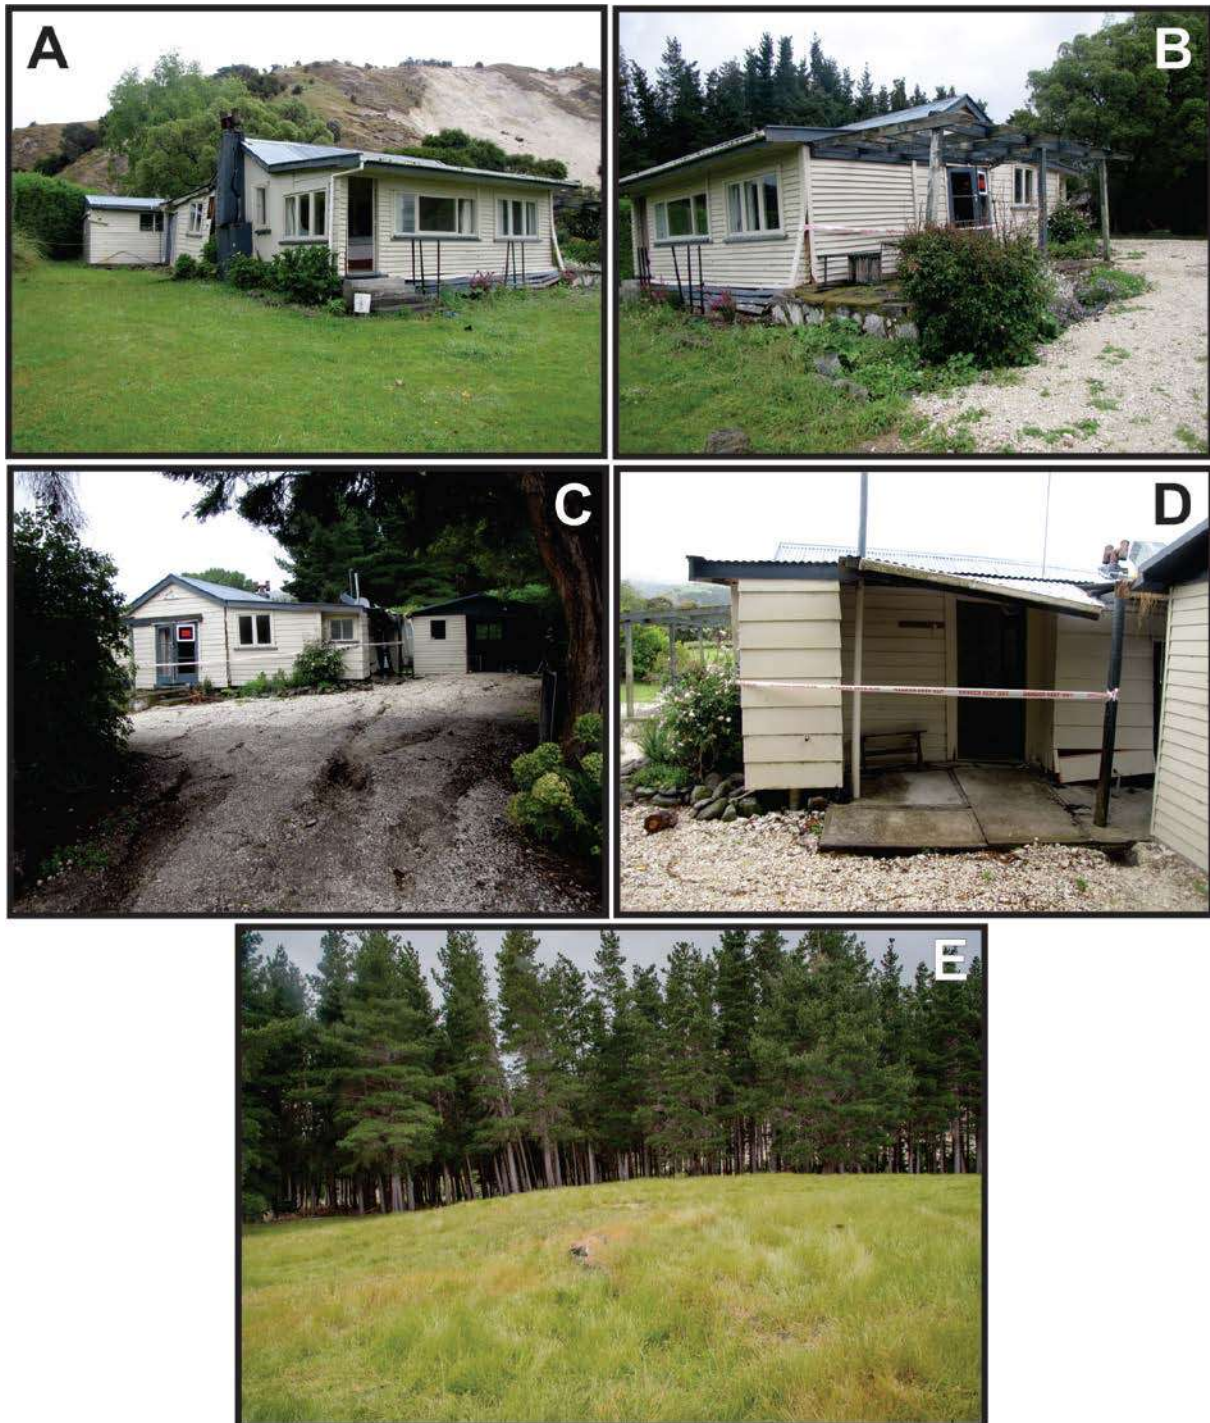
Middle Hill Cottage and Papatea Fault surface rupture; see Figure A2.14 for location (Lat: -42.1536, Long: 173.8667). (A) View looking west. Photo by Rob Langridge, taken in December 2016. (B) View looking south-southwest. Photo by Rob Langridge, taken in December 2016. (C) View looking southeast along the strike of extensional fissures located in the crestal region of the primary fold/fault scarp that extend toward, and intersect, the cottage. Photo by Rob Langridge, taken in December 2016. (D) View looking northeast. Photo by Rob Langridge, taken in December 2016. (E) View from the cottage looking south-southeast along-strike of the Papatea Fault's surface rupture deformation zone. Prior to the 2016 rupture of the Papatea Fault, the ground surface in this photograph was approximately flat and horizontal, and the trunks of the pine trees were all sub-vertical. Photo by Stefano Pucci, taken about a year after the earthquake.
